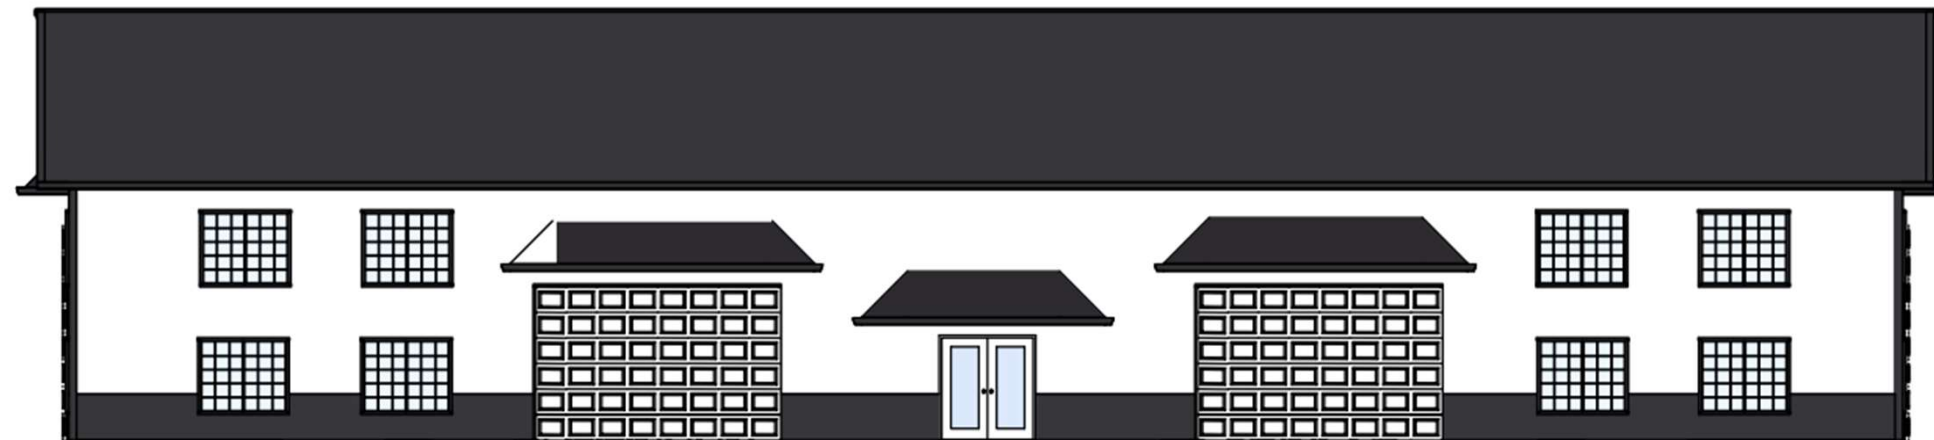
Other Preliminary Plans (Building Plans & Sign Plan)
